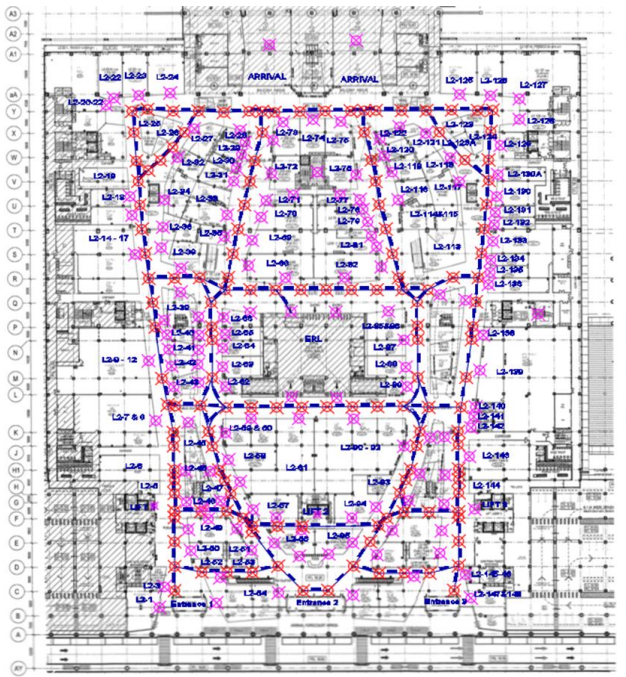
AutoCAD Drawing Node and Distance of Floor Plan Level 2 in Gateway KLIA2
